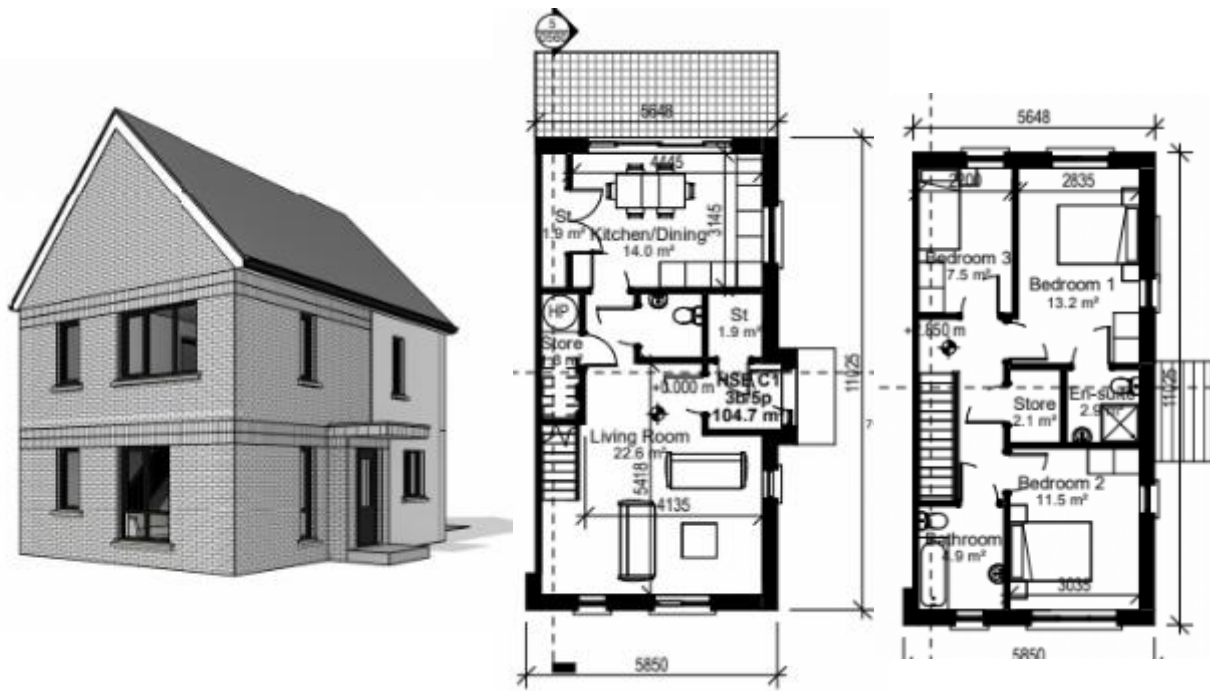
Front elevation and Proposed Ground and First Floor Plan of House Type C1.
